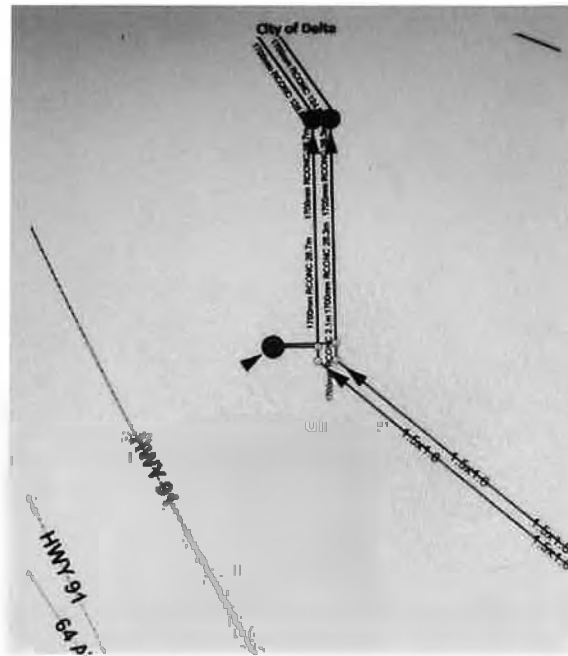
City of Delta connecting sewers to metro Vancouver trunk Sewers
